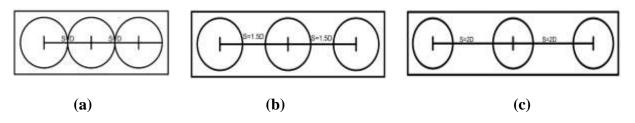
Pile group arrangements for 3 Piles with spacing between piles (a): S=D, (b) =1.5D and (c) =2D
